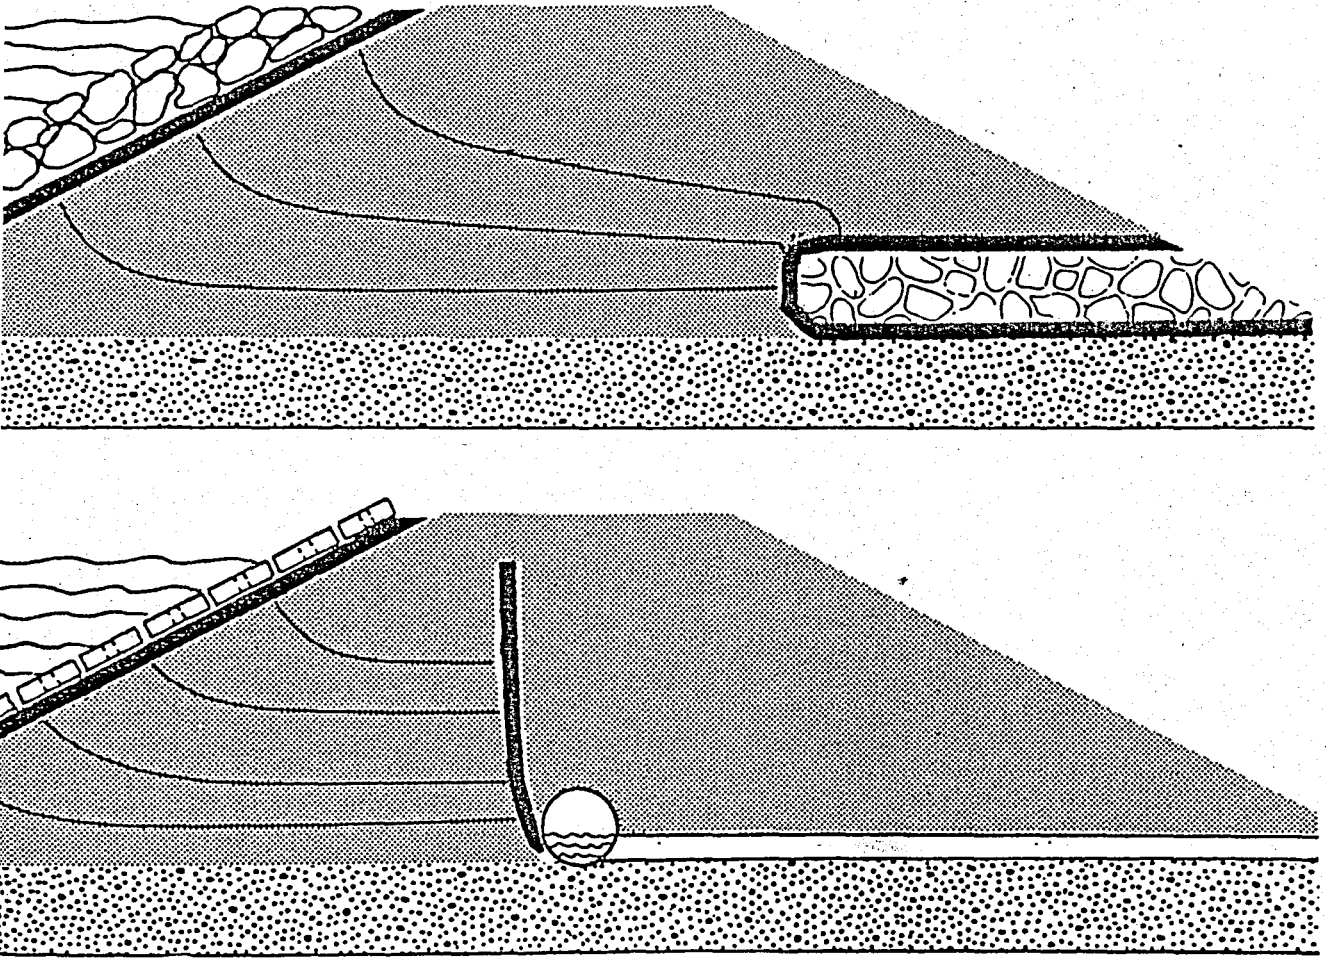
PROTECTION OF THE UPSTREAM FACES OF EARTH DAMS
